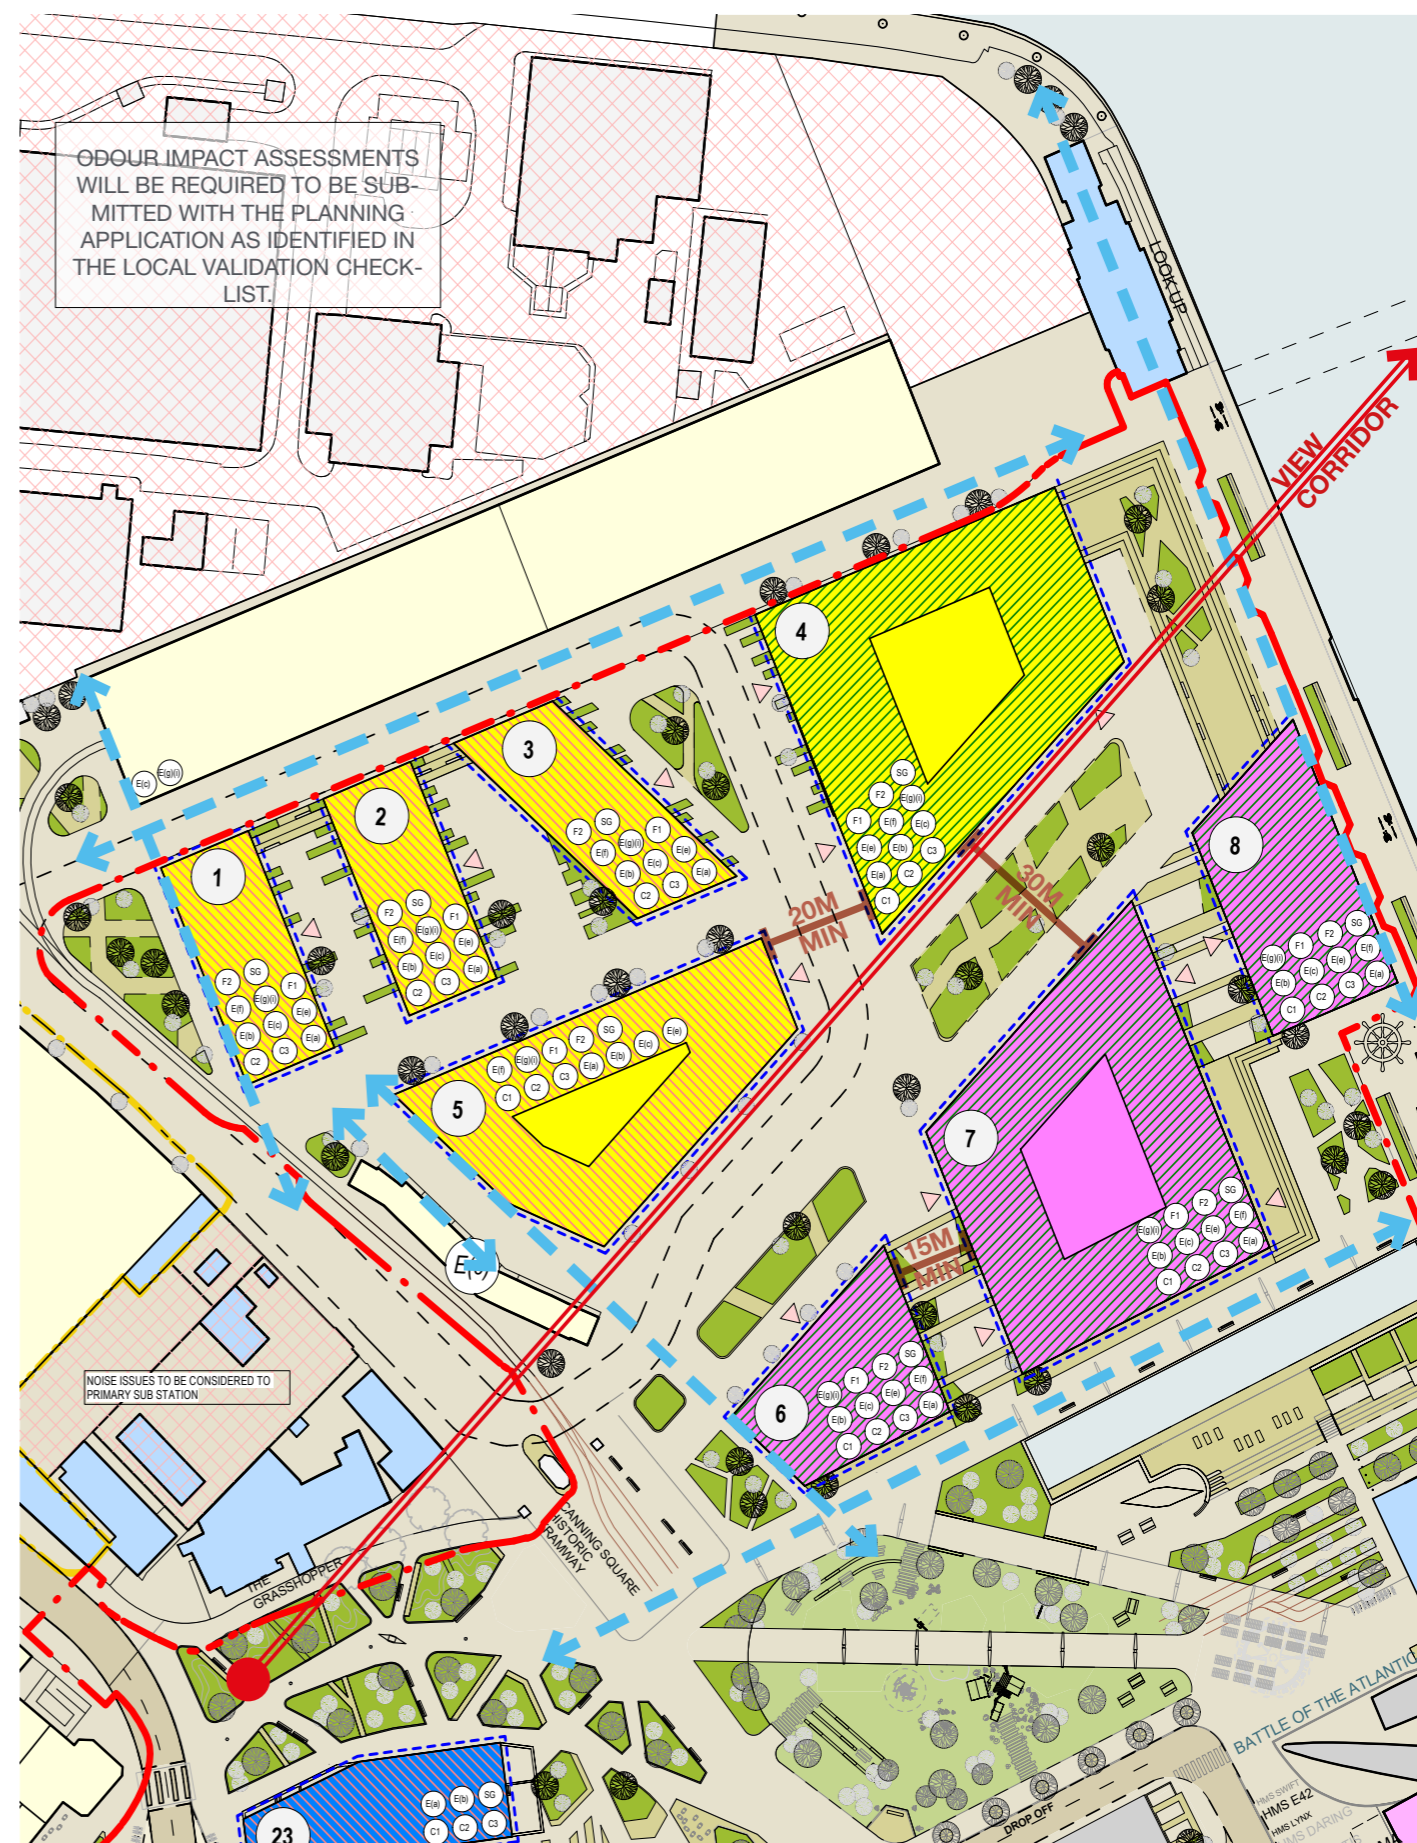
Illustrative Masterplan Parameter Land use Plan
